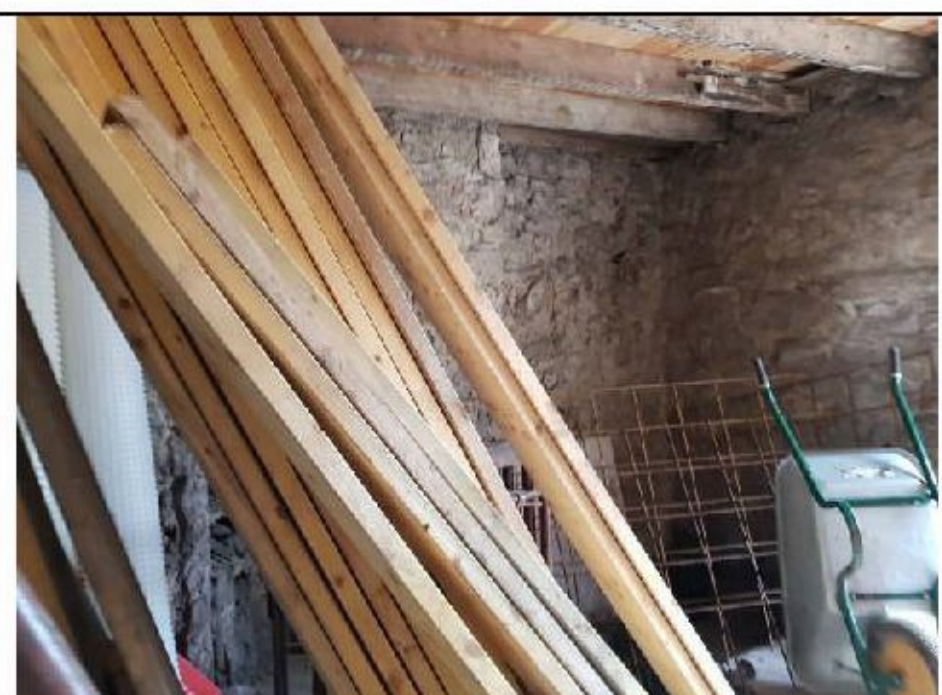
Buildings at rear of garden which will be unaffected (2)
